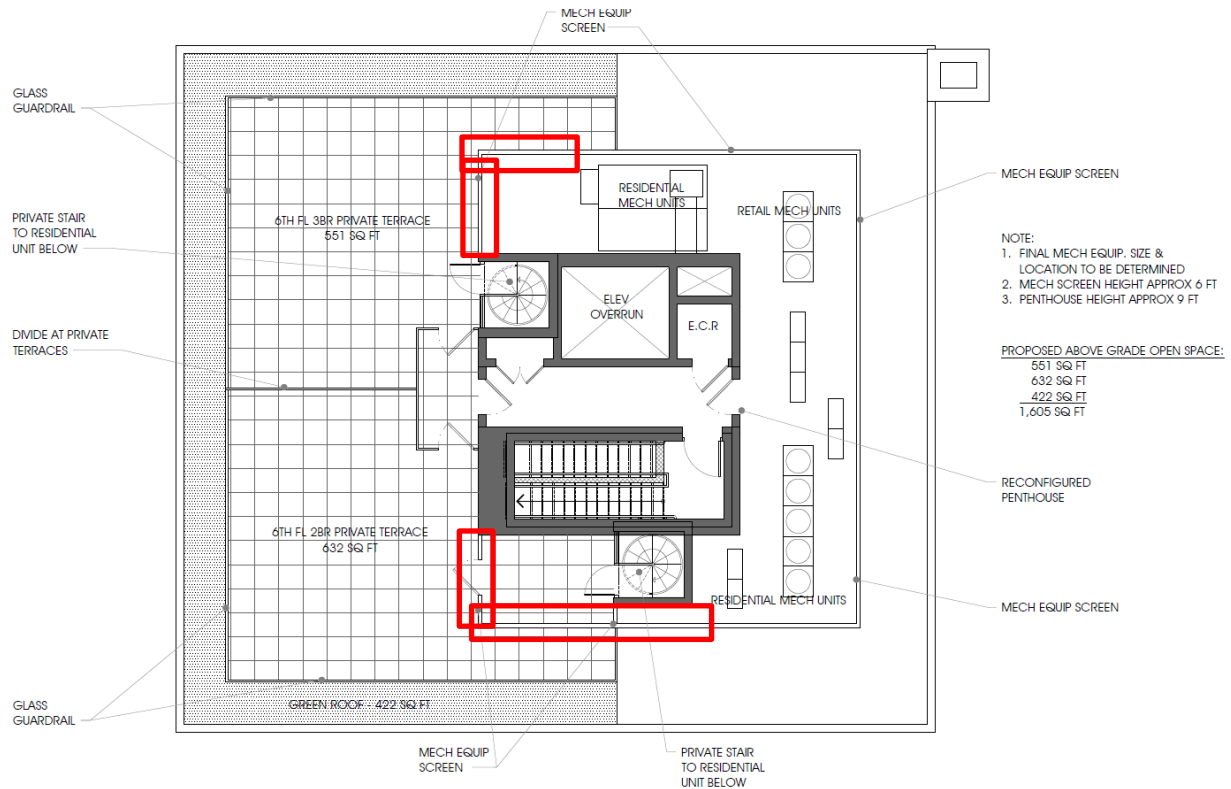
Proposed roof plan with staff highlights where six feet of mechanical screening may be unnecessary.
